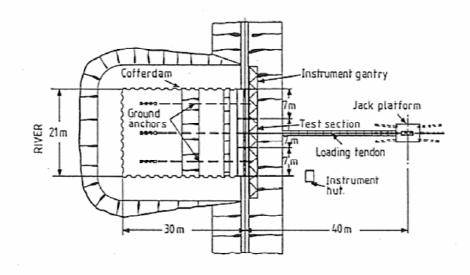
Use of anchored diaphragm wall for deepening of existing canal (from Hanna, 1982)
